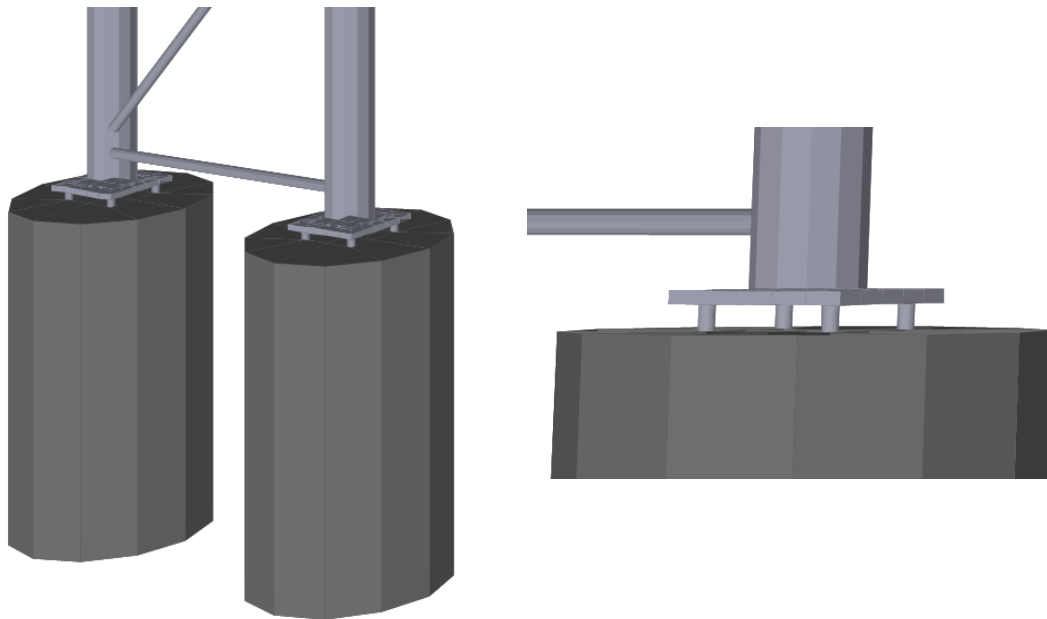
Base Plates, Anchor Bolts, and Foundations for Structure A
